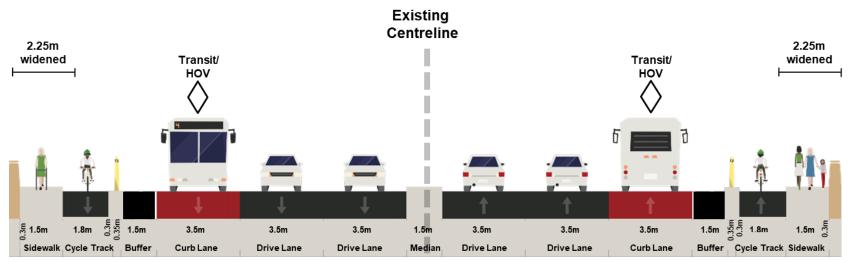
Alternative 5.2 - Structure Widened by 2 Girders, 2 Piers, Sidewalk and Cycle Track on Both Sides (No Road Shift)
